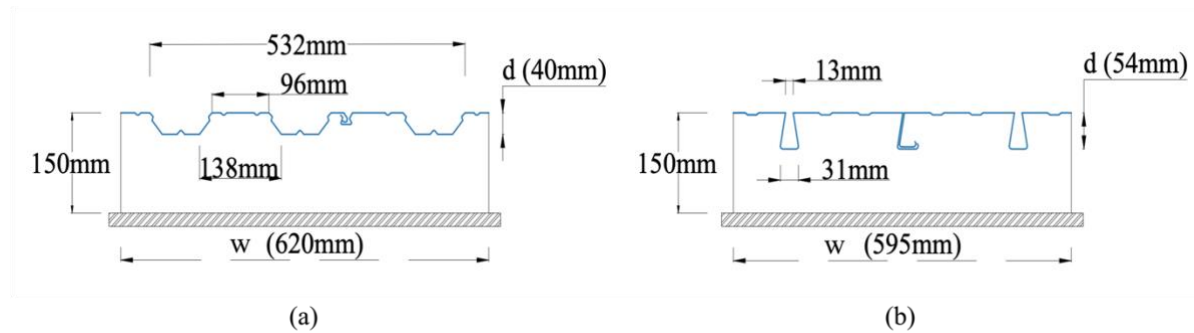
Cross-sectional configuration of specimen a) trapezoidal (TR); b) dovetailed (DT)
